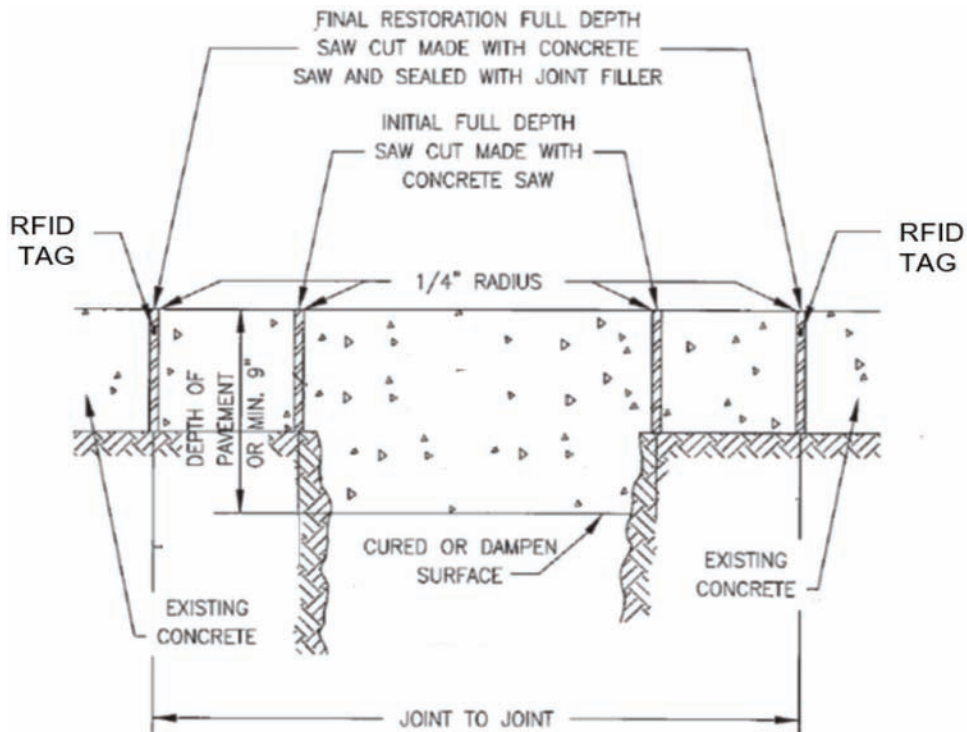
Placement of RFID tags in concrete pavement (City of Dayton, 2016).
